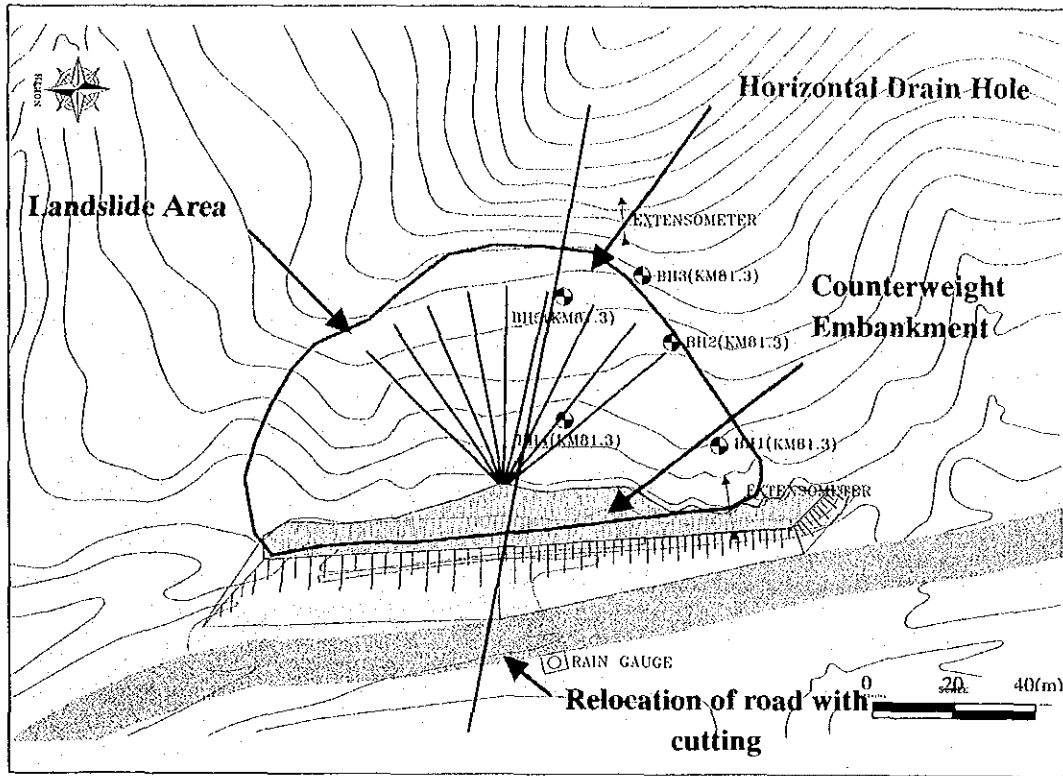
Plan of counterweight embankment in CH 81.30 km
